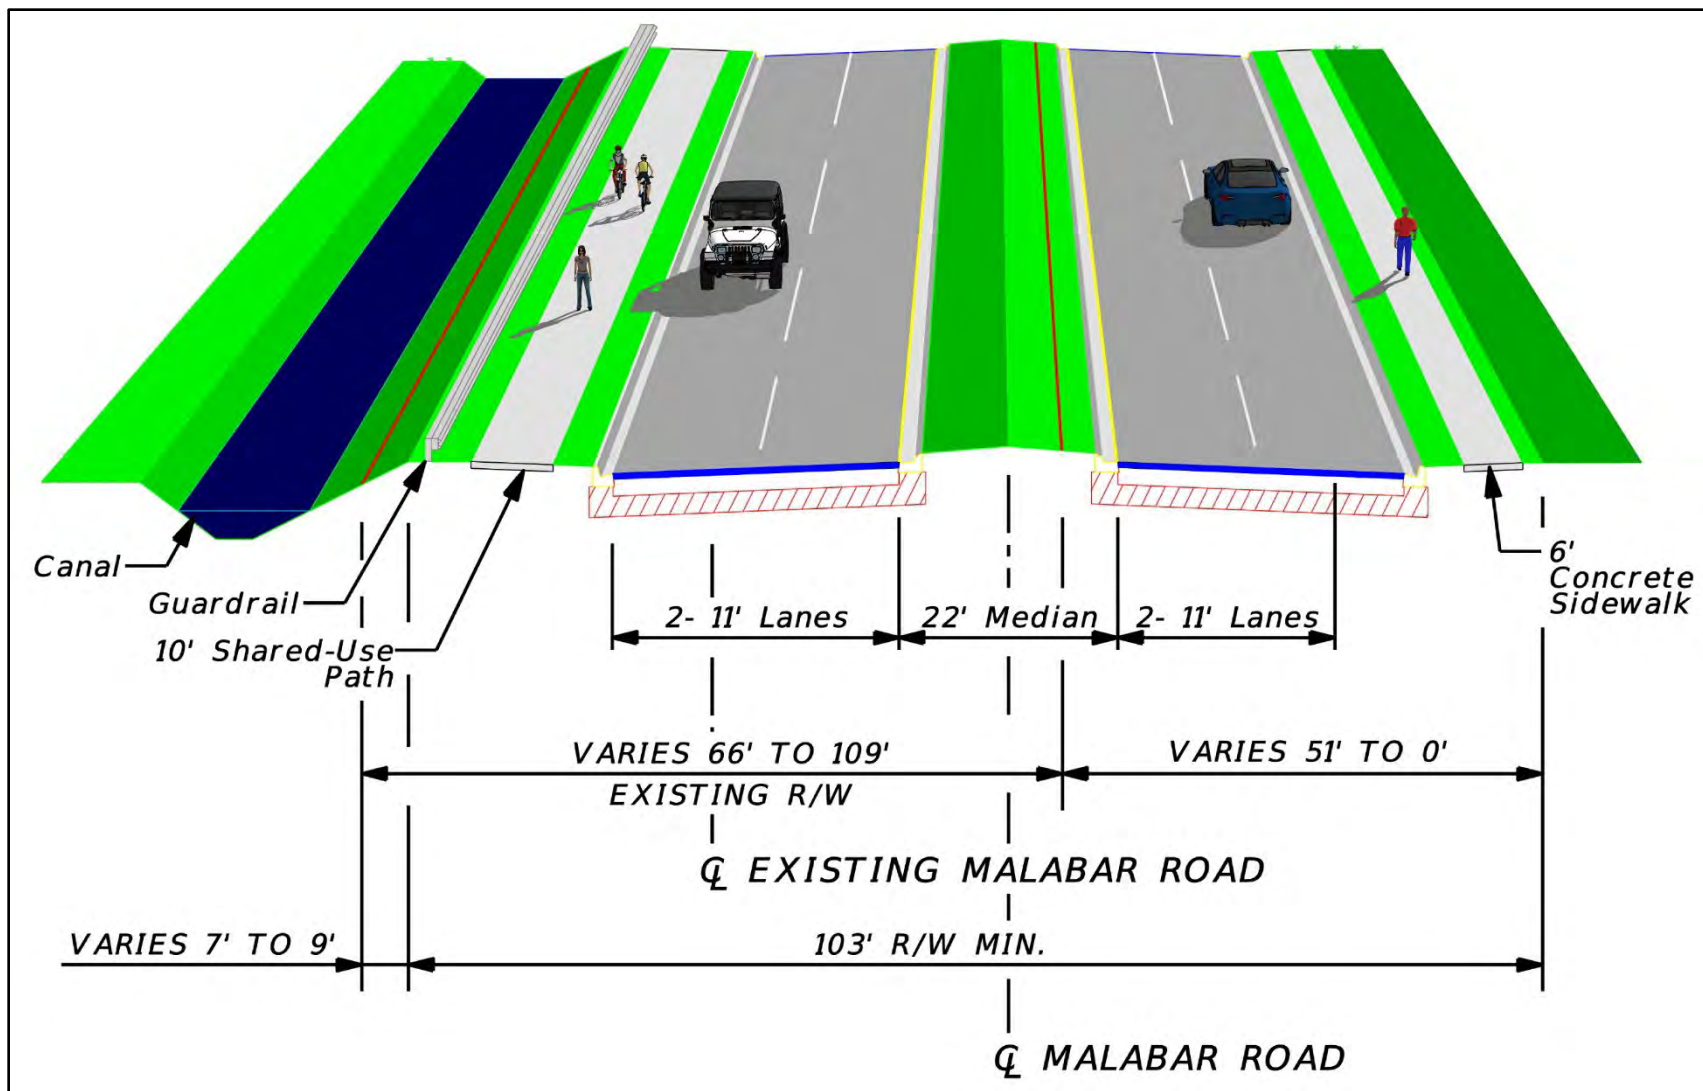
103' Alternative B – Canal C-10 to Sta. 256+80
